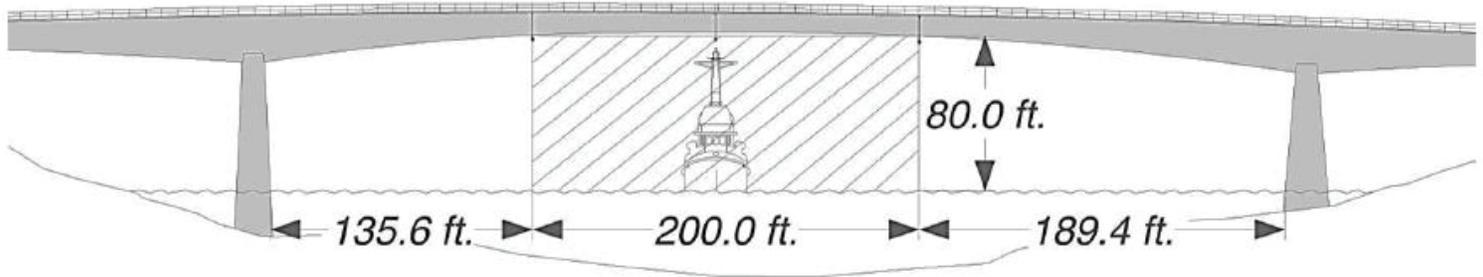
Bridge elevation view indicating navigation channel clearances to substructure units in the waterway.
